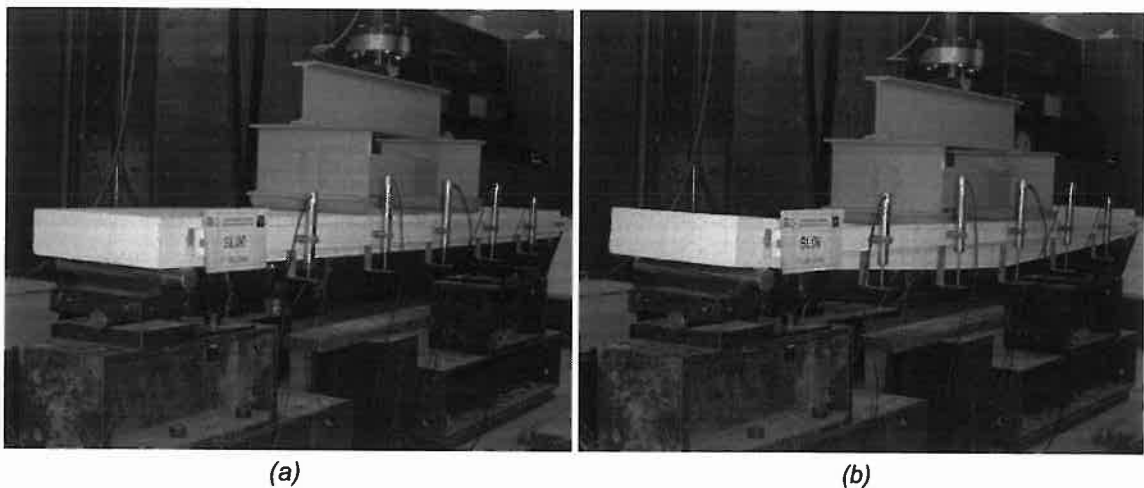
Specimen SL06 before (a), and after have been tested (b).
